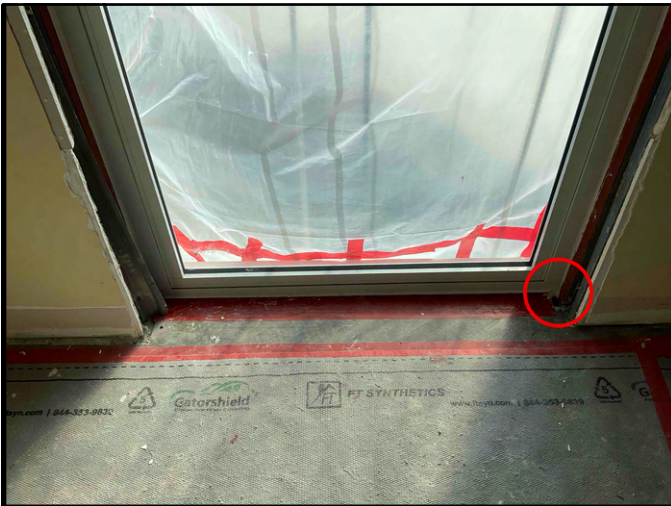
Unit 1000 - View of sealant joints to be removed and replaced at not cleanly tooled locations.
